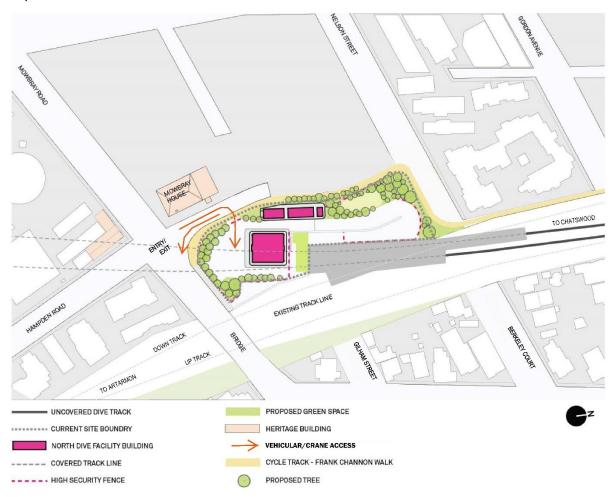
Chatswood Dive Precinct Plan – Site vehicular access
